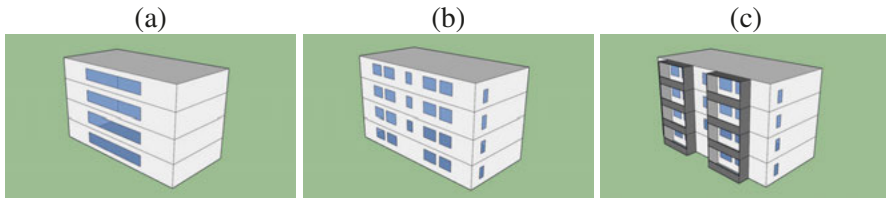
Level of detail in building modeling: (a) LoD1, Shoe-box model of the building with 25% window area on long walls, (b) LoD2*, Detailed building model excluding the shading components, (c) LoD3, Detailed building model with the precise geometry of windows and shading components
